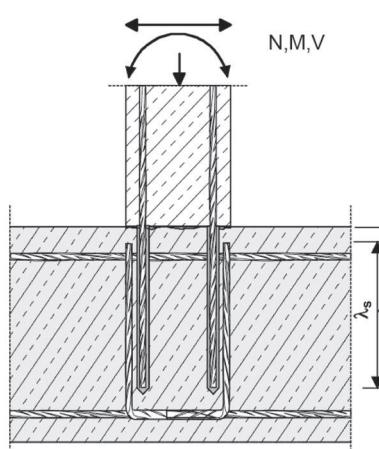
Bond superimposed to a foundation of a column or a wall where the rebars are subjected to tensile force.
